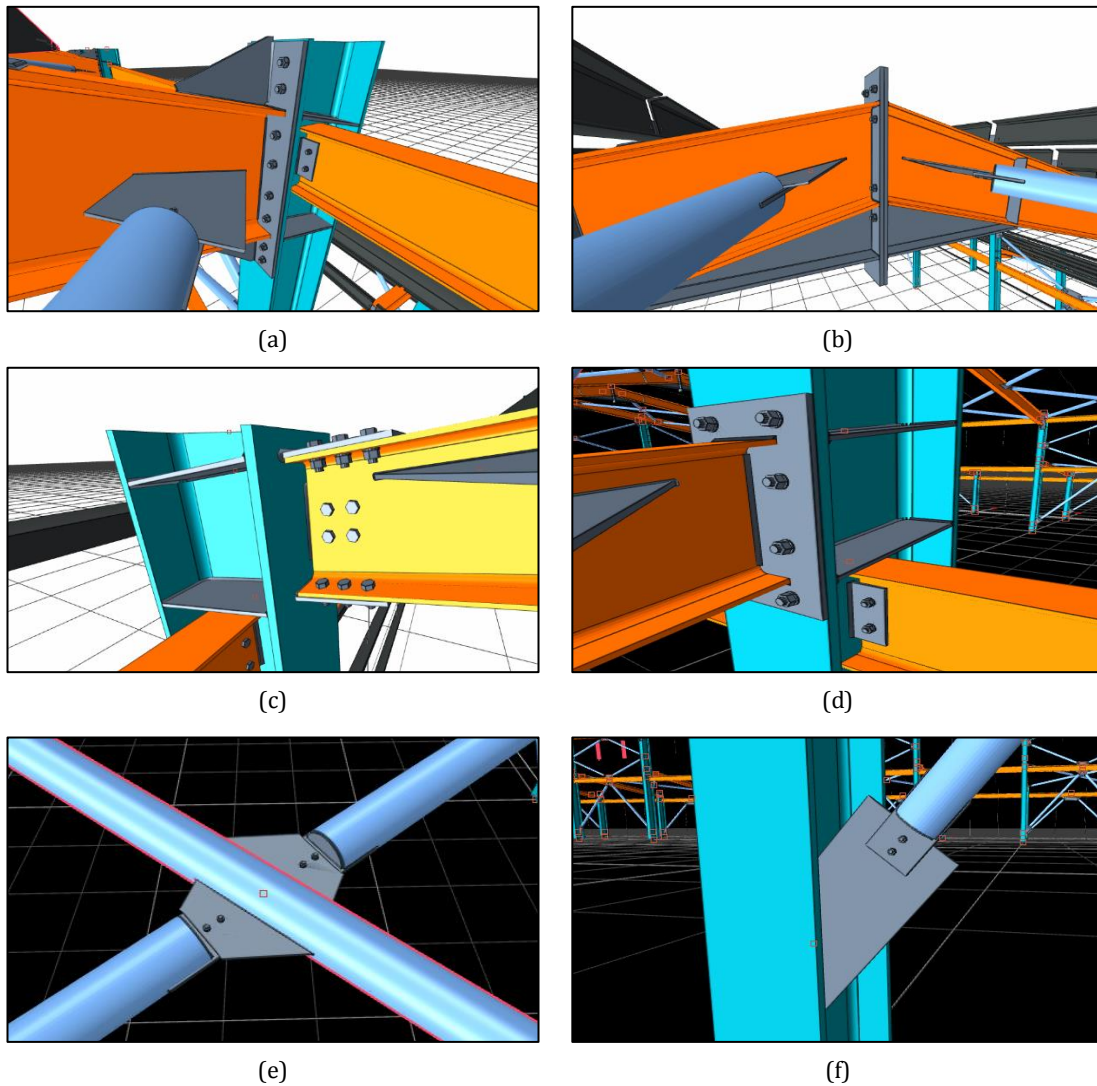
(a) Column-beam (ridge) joint with rigid face plate; (b) Beam-beam connection with face plate; (c) Bolt joint with head plate (side ridge 1); (d) Cross-beam junction (side ridge 2); (e) Cross-body combination; (f) Cross-end combination.
